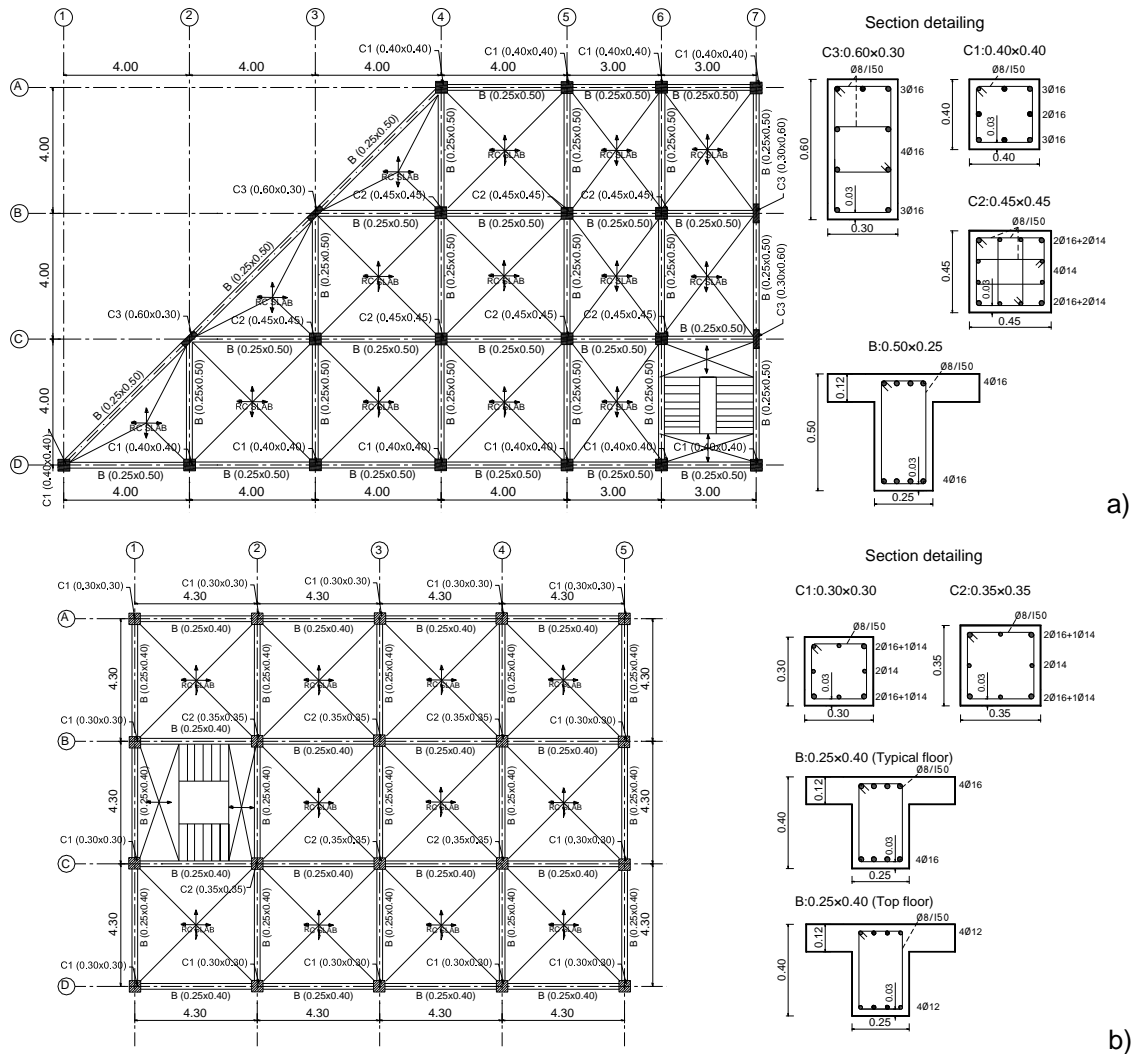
Plan view of a typical story of the 3-Ir, 4-Ir and 5-Ir buildings and design details (a) and plan view of a typical story of the 3-R, 4-R and 5-R buildings and design details (b)
